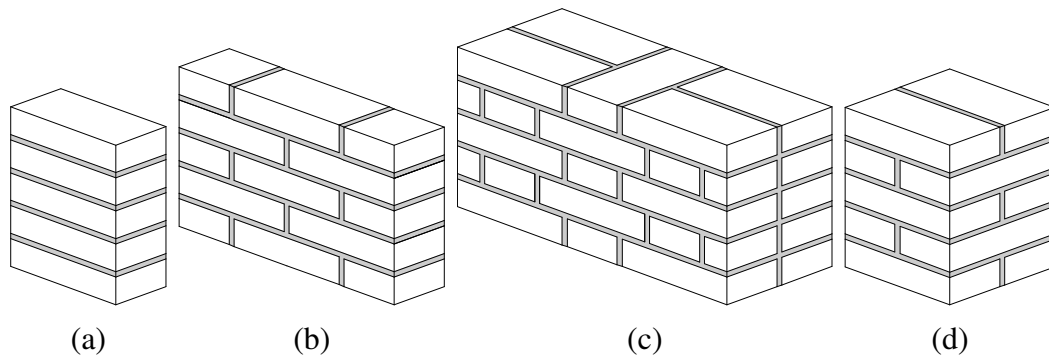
Model geometries: (a) stack bond prism, (b) running bond wall, (c) Flemish bond wall and (d) English bond column.
